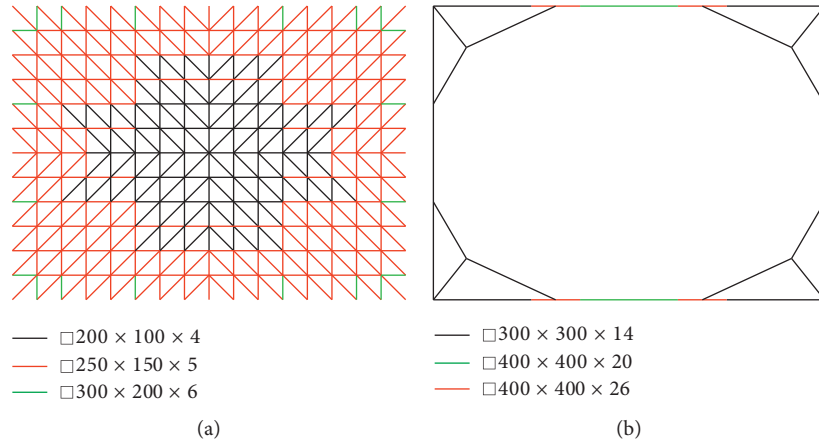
Member sections of the latticed shell. (a) Roof members; (b) boundary beam structure.
